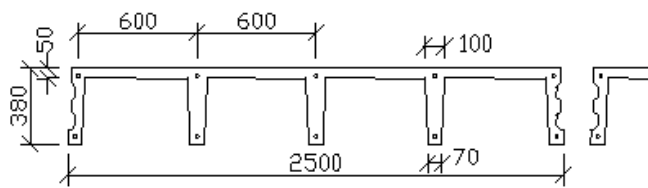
Longitudinal cross-section of precast segments. Longitudinal ribs are 50 mm-wide only at bottom. Lengths in mm.
